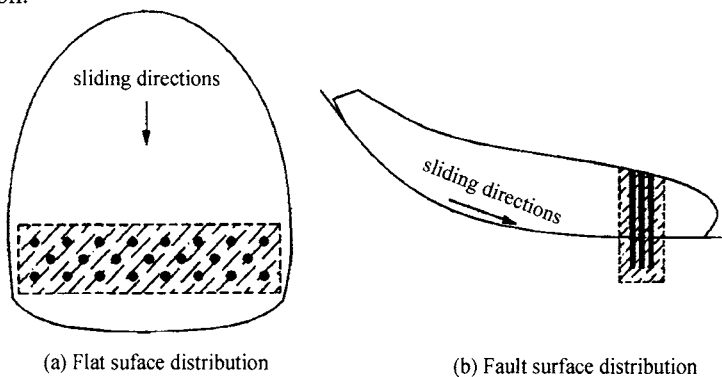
Schematic diagram of steel-tube bored grouting anti-sliding retaining wall
